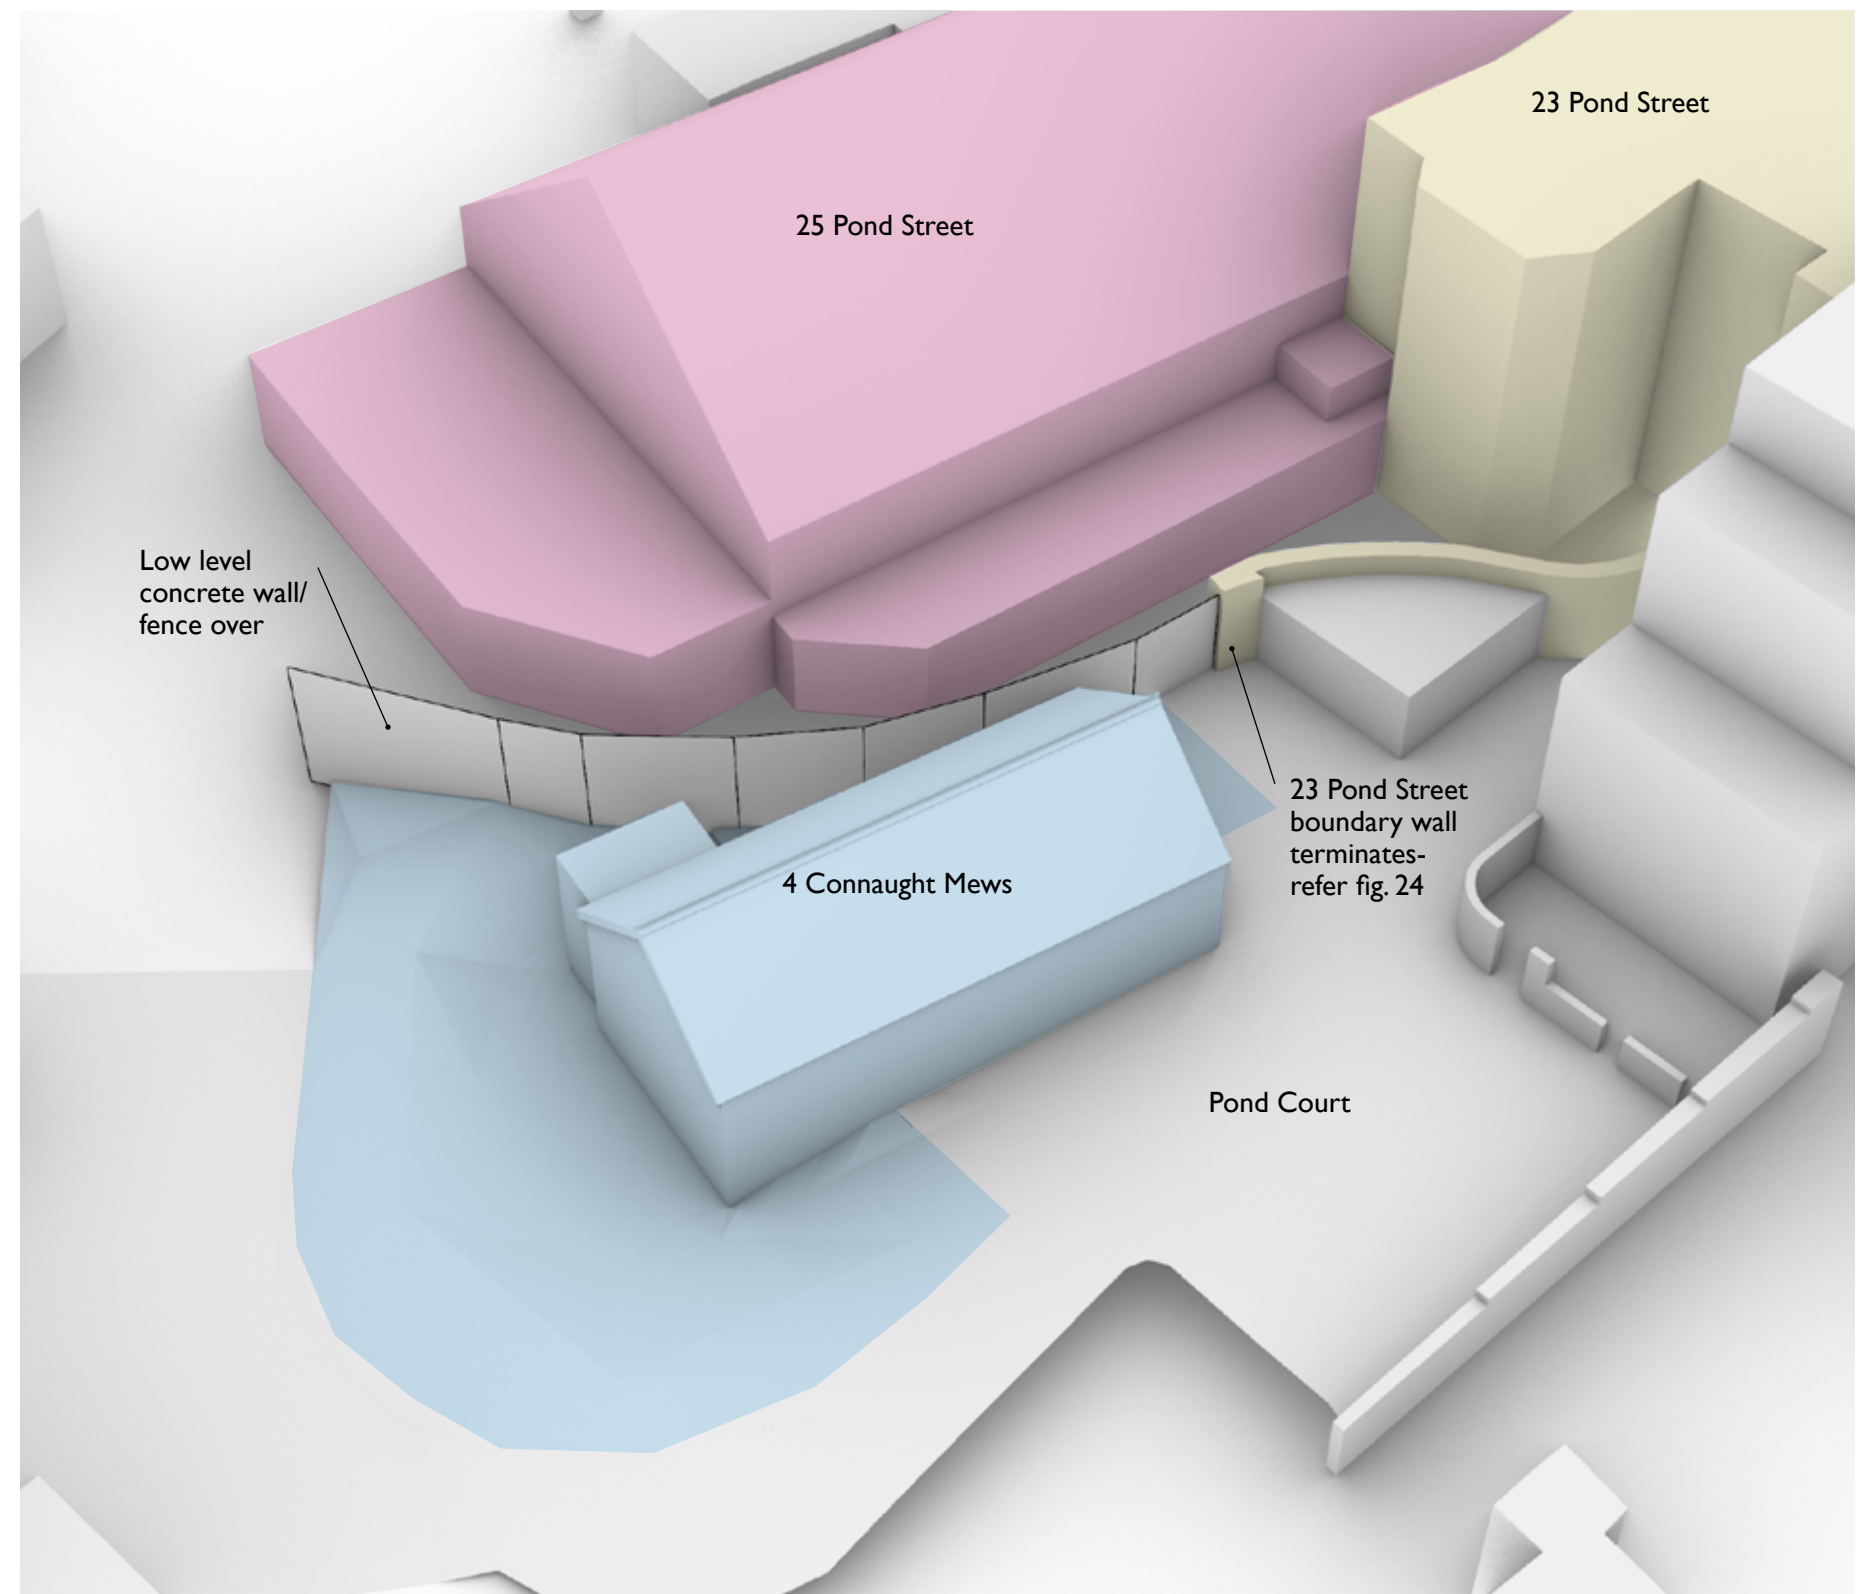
Proximity of listed building curtilage of 23 Pond Street defined
